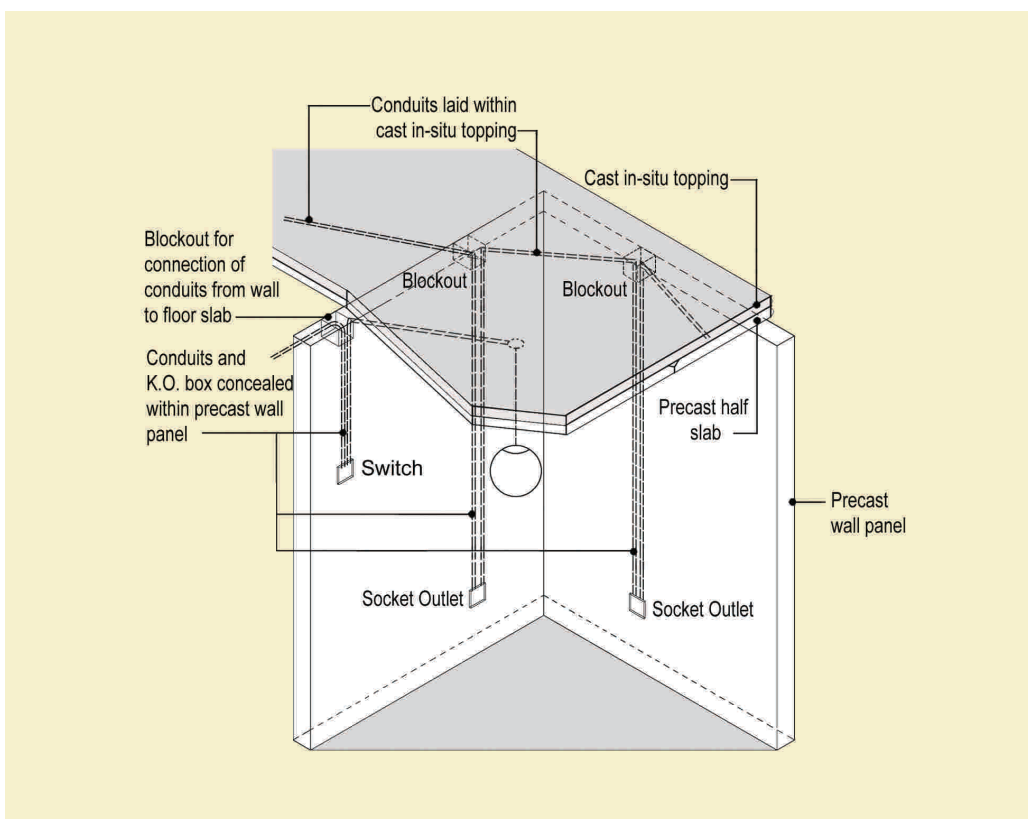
Connection of conduits between wall plan and floor slab using second approach
